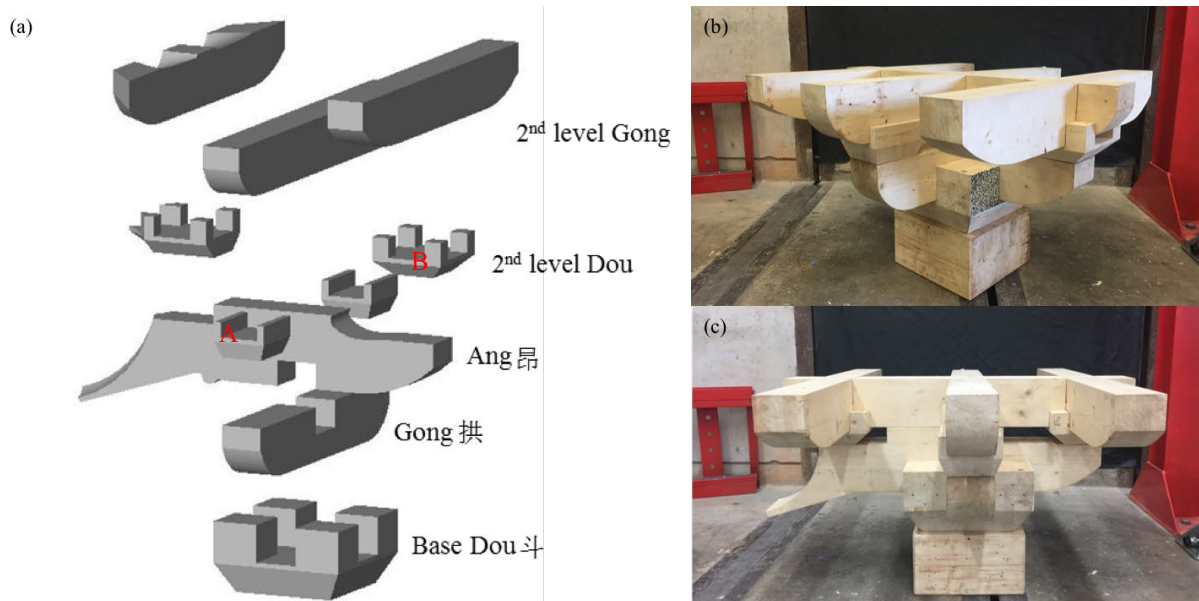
(a) 3D exploded view drawing of Dou-Gon; (b) and (c) Dou-Gon set up without dead loads
